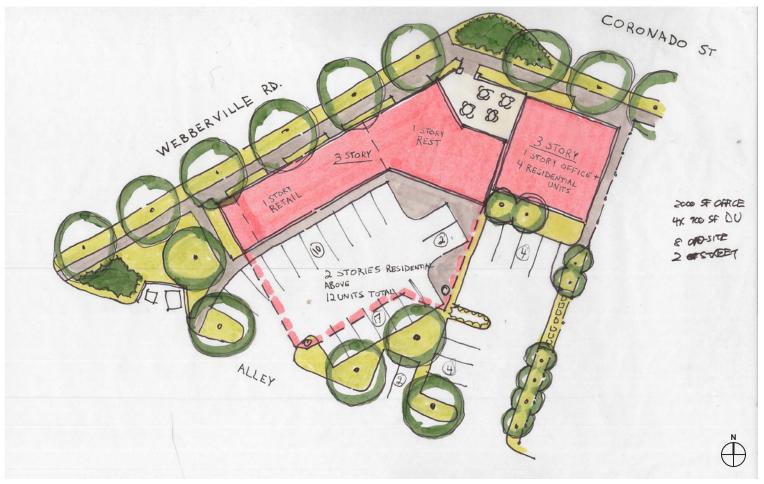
Webberville Road at Coronado Street Redevelopment
